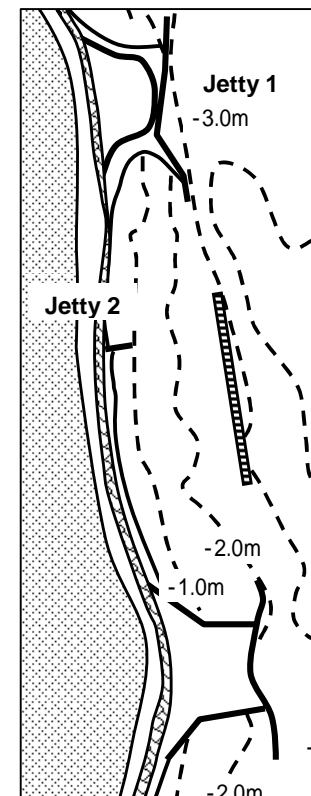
Plan Shape of B-1 and B-2 Sections
